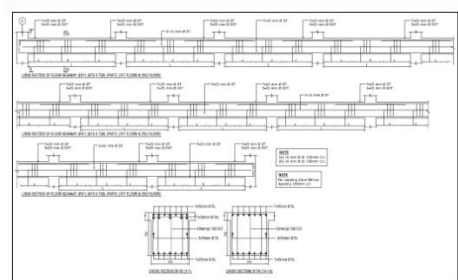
Typical long section and x-section of Beam for SDC D (SMRF)
